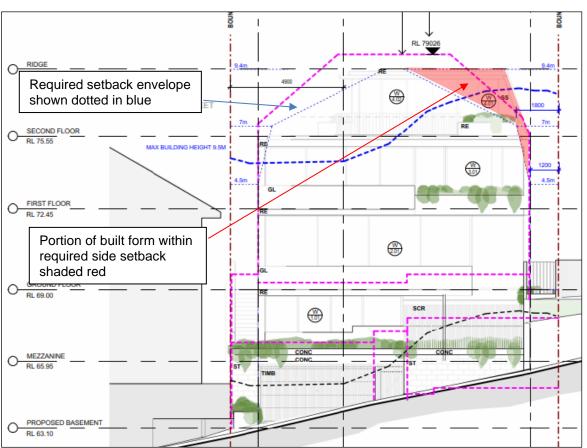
Extract of Elevation 1 plan prepared by Smyth & Smyth.
